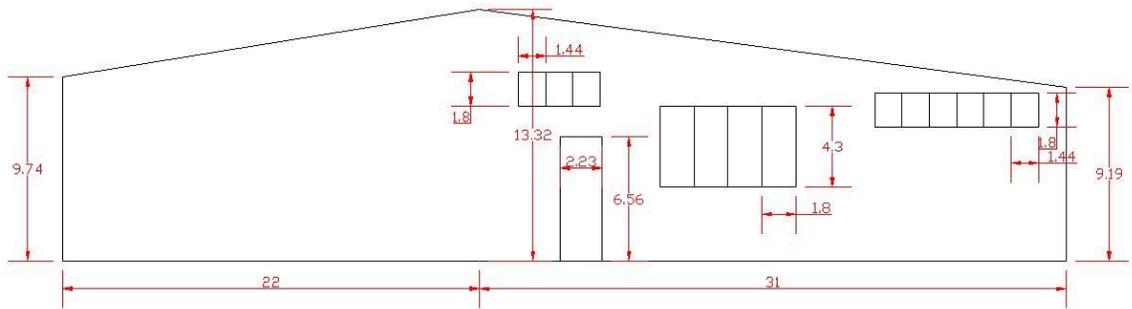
Side 2 of the building, facing South East drawing details dimensions in feet
